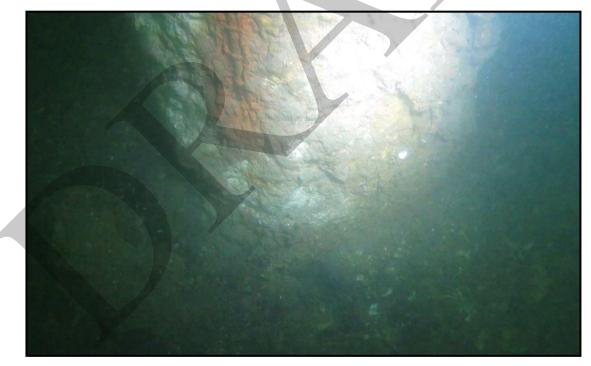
Pier 2, Pile 43-H - Exposed reinforcing near the mudline.
